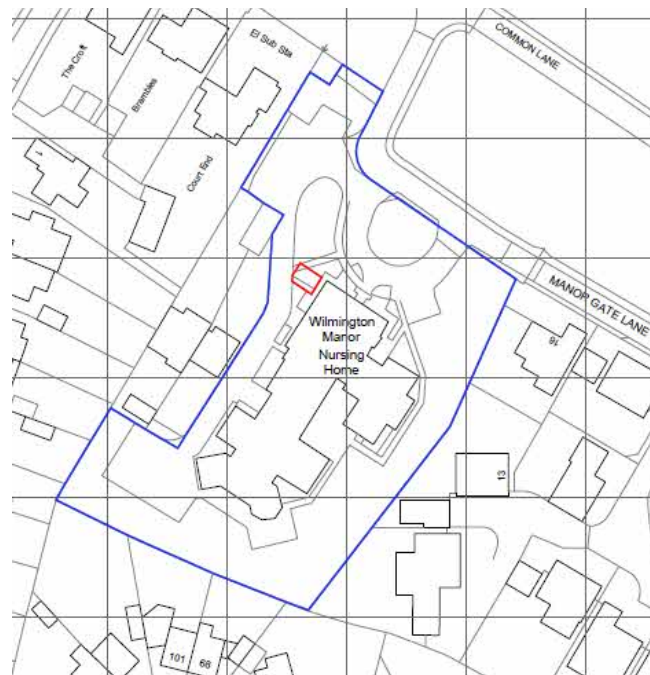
Site Location Plan, prepared by Plan Architecture (site area boundary marked in red; Wilmington Manor Care Home boundary marked in blue)
